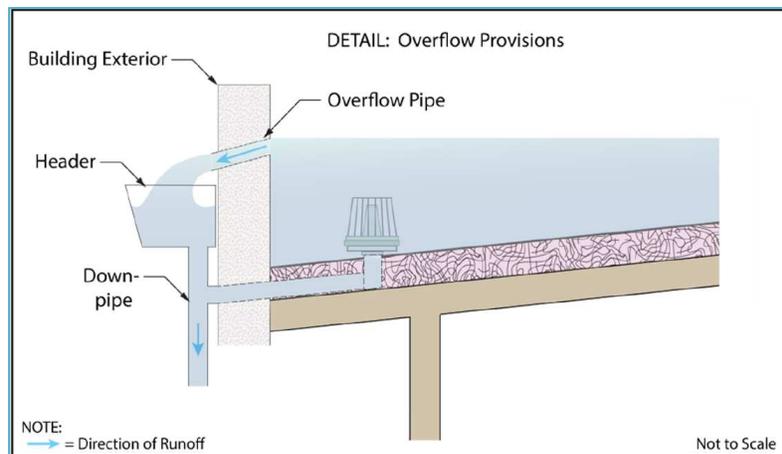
Potential configuration for an overflow structure used in blue roof applications³⁶
